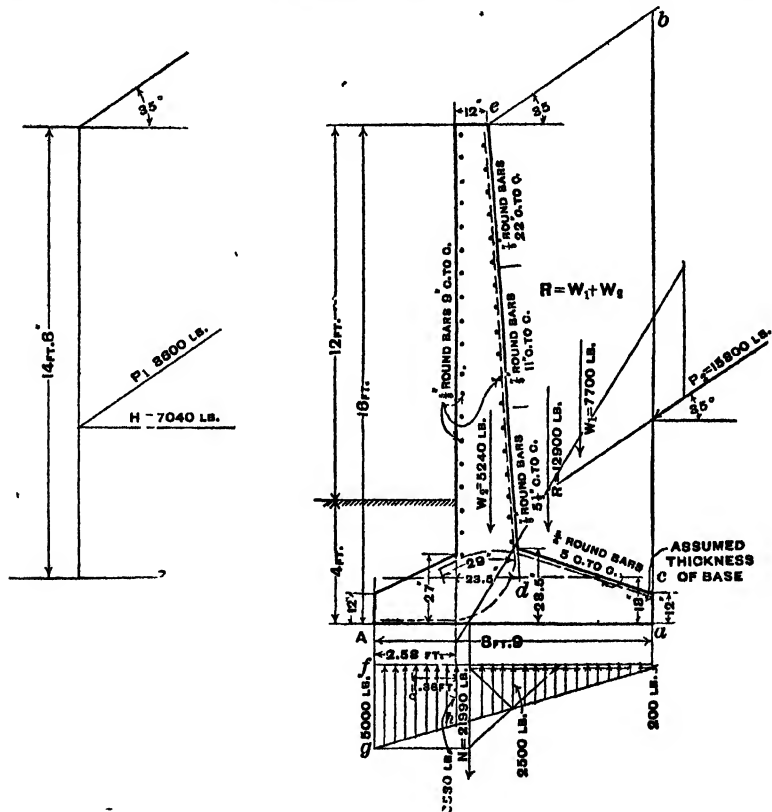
Design of T-shaped Retaining Wall. (See p. 669.)
